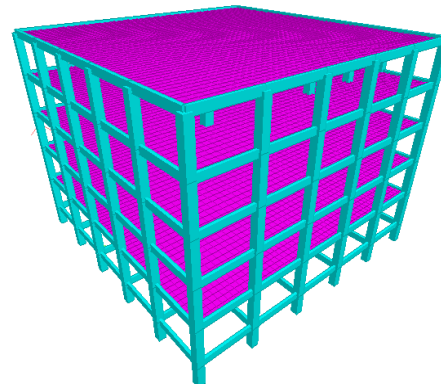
Model of Flat Slab building without Masonry Infill Wall
